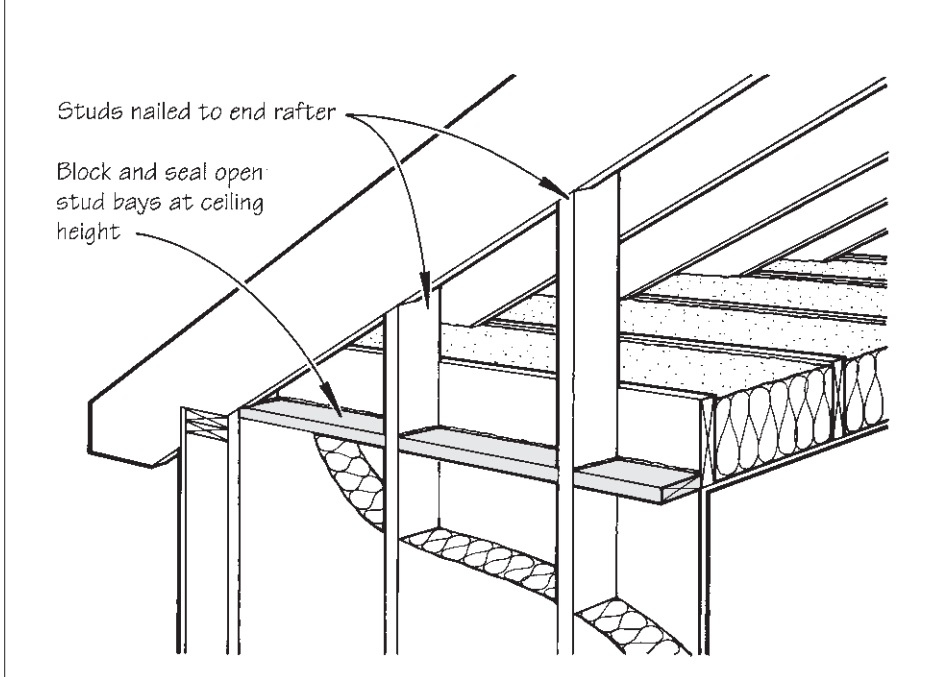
Balloon-framed exterior walls should always be blocked to prevent convective air movement into the attic.
